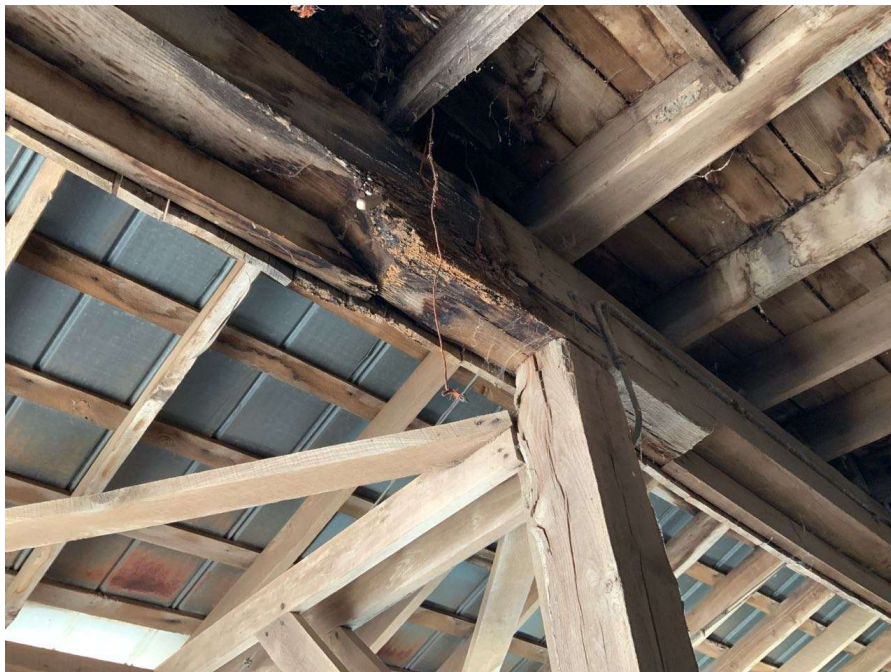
Water damage and rot at west end of floor beam between Columns R/4 and S/4 (looking southwest). Supporting column cap at Column R/4 has similar rot.
